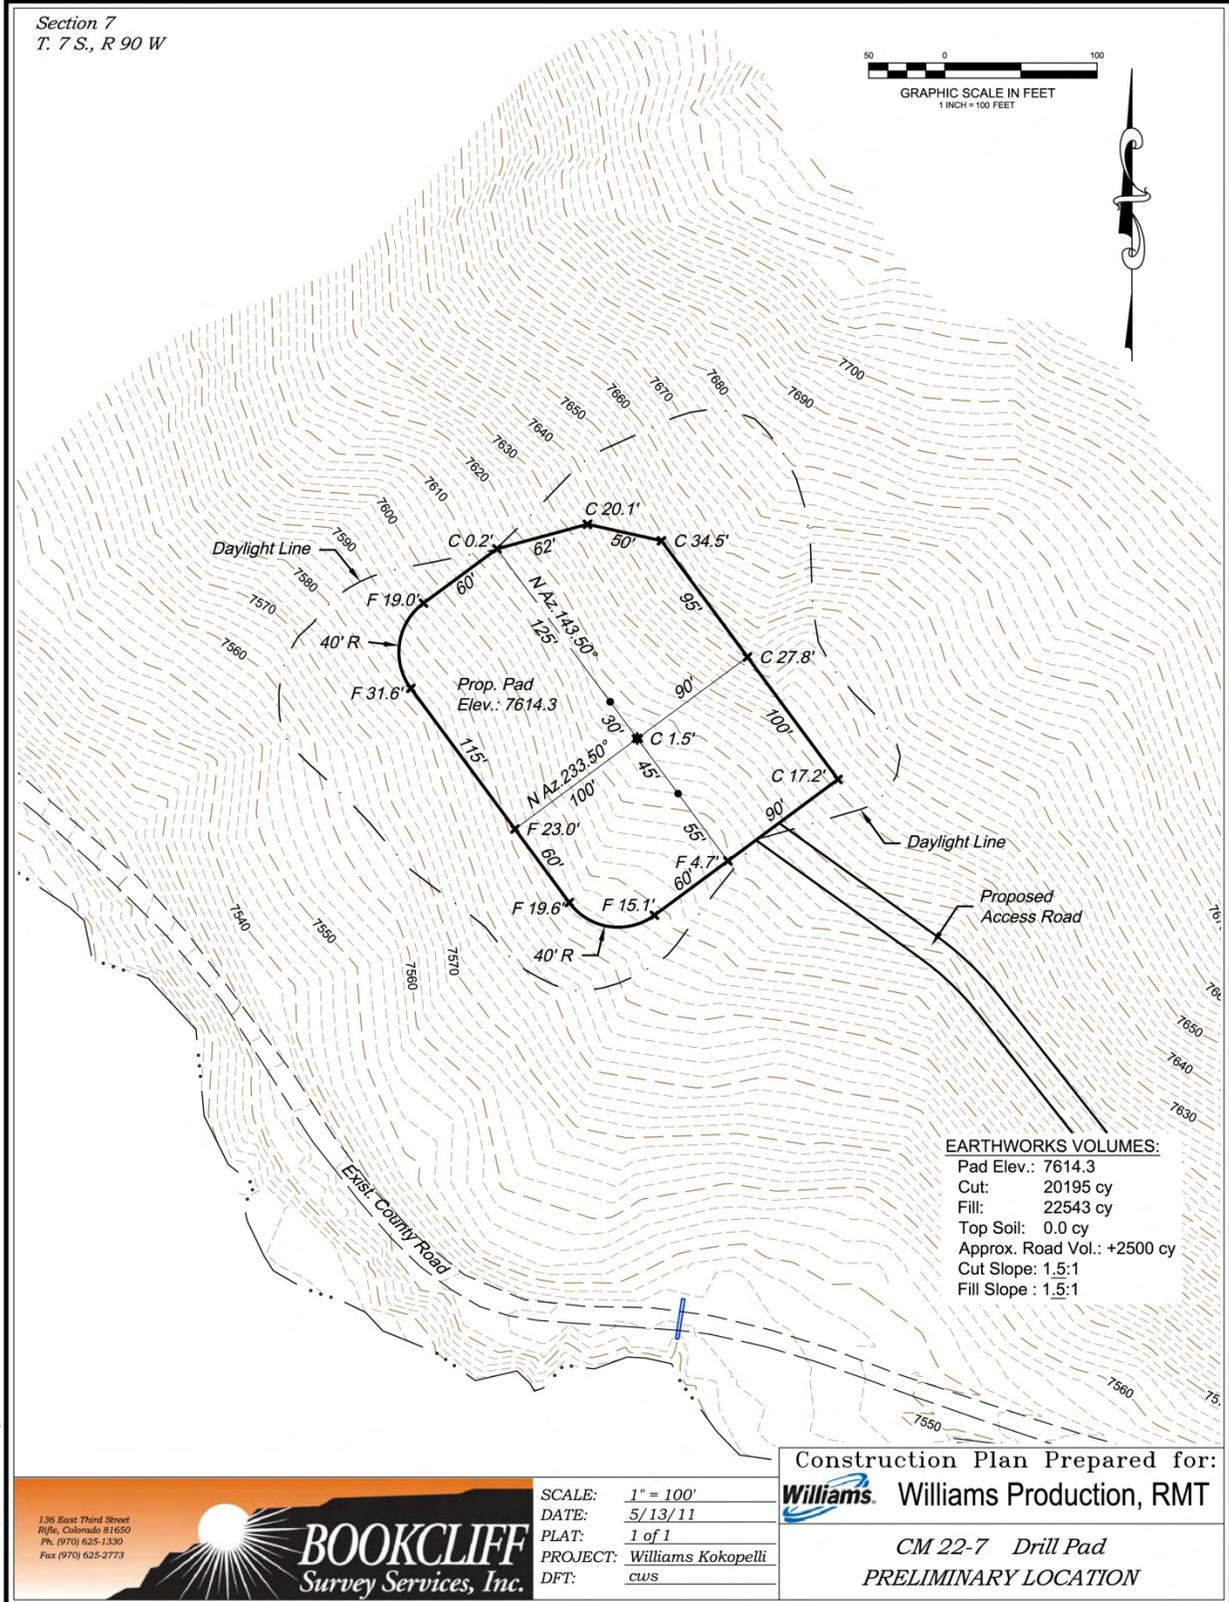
CMU 22-7 Construction Layout for the One Exploratory Well
